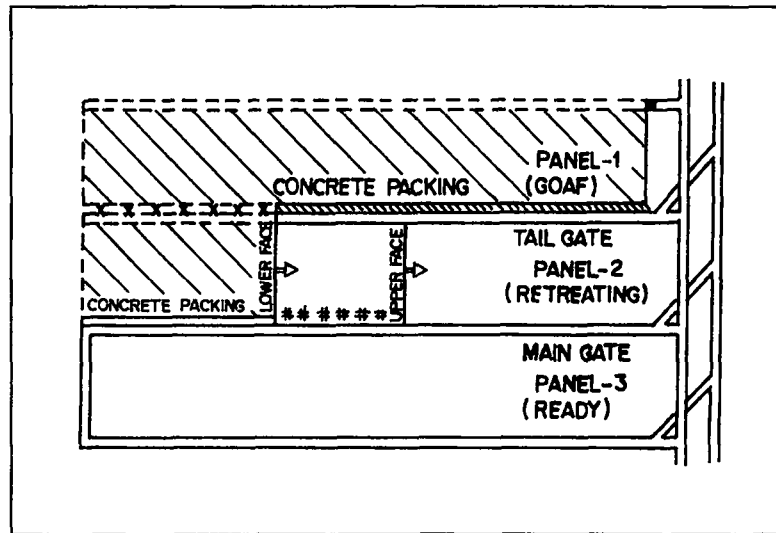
Plan view of longwall panel and position of gate roads in Çayırhan coal mine (after Ünal and Özkan, 1993)
